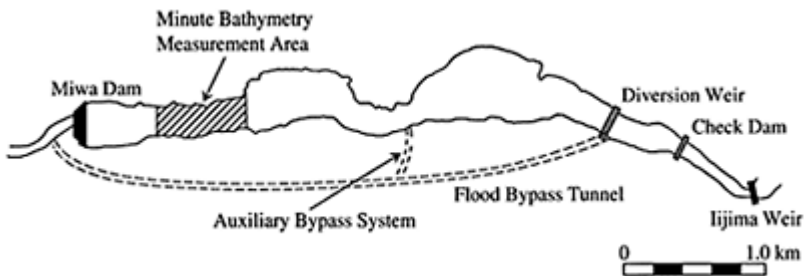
Plan view of the Miwa Dam Reservoir and the redevelopment project facilities.
